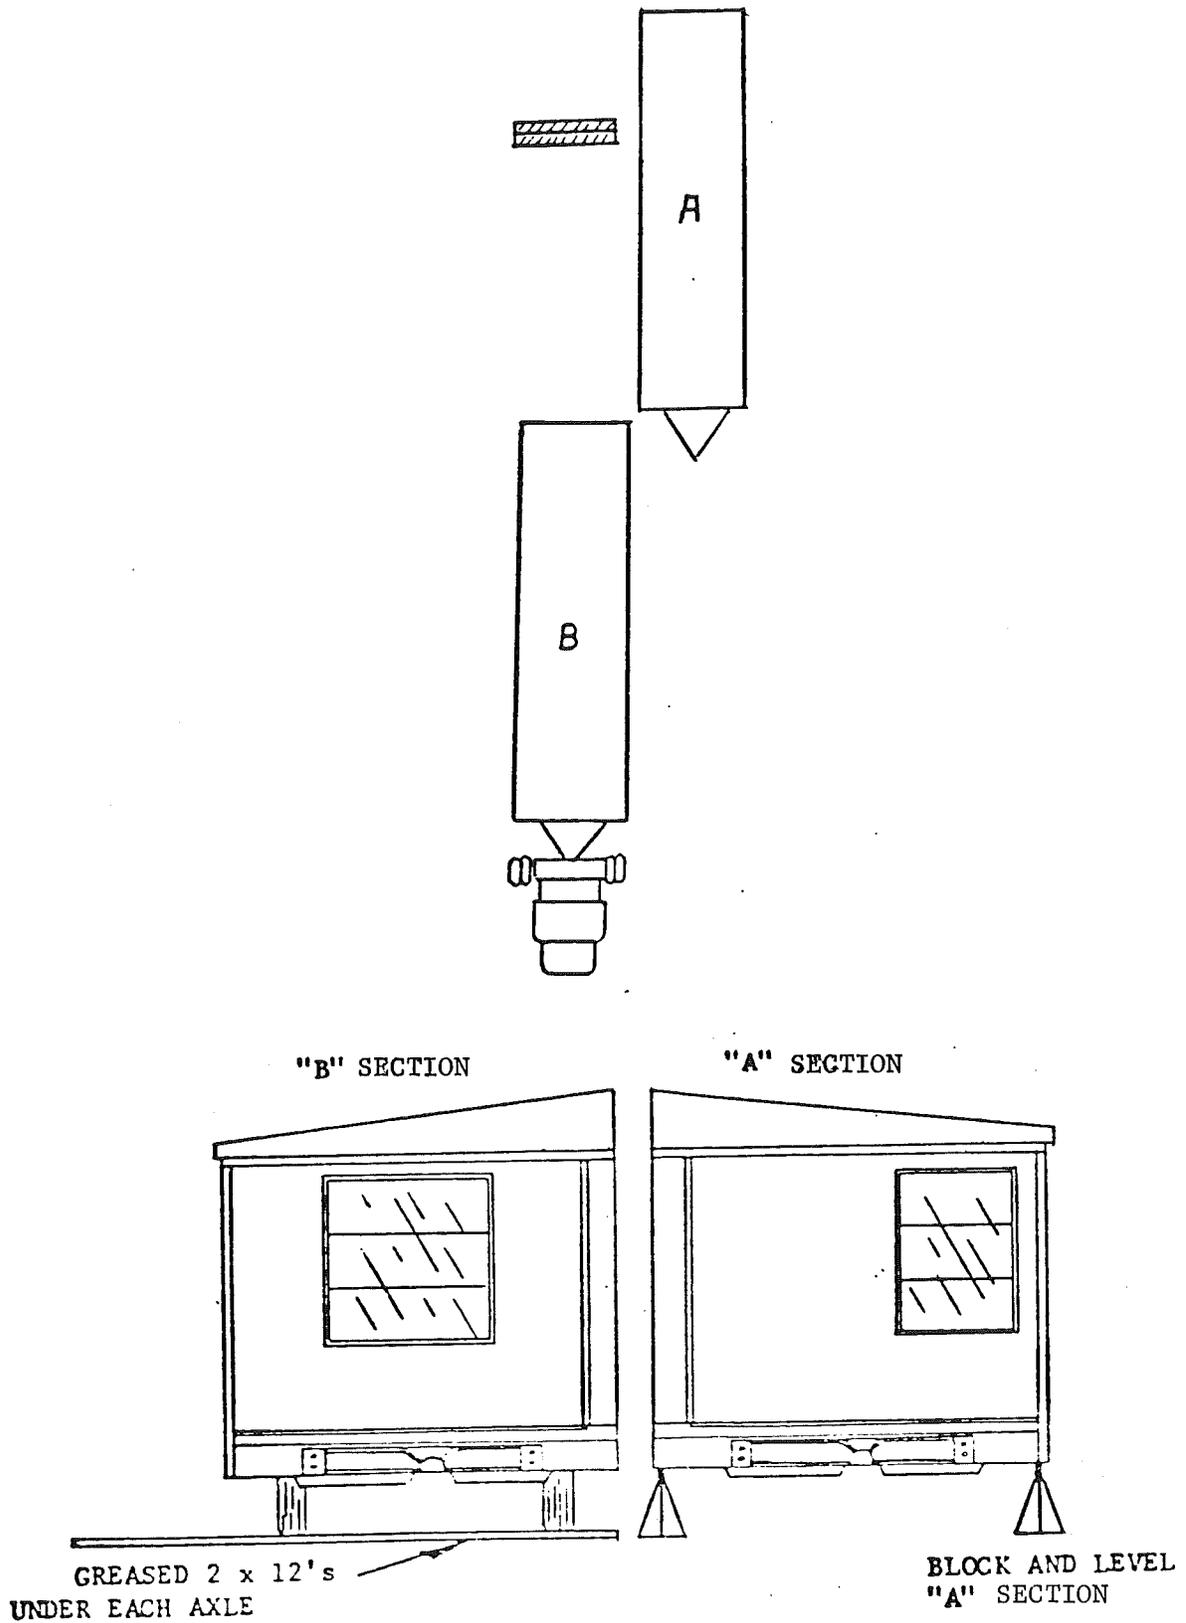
MANUFACTURED HOME PLACEMENT
